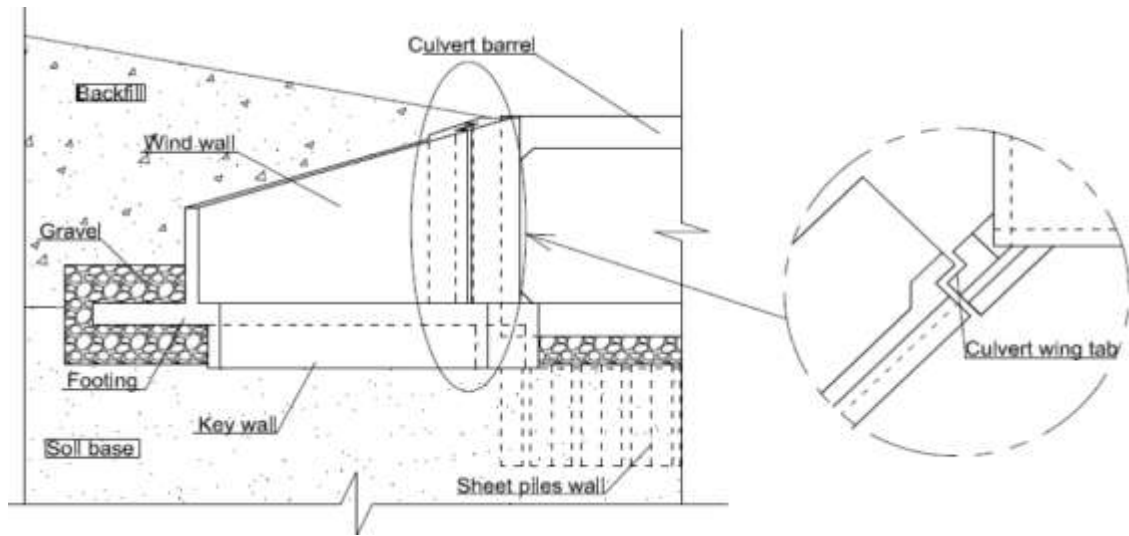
Front and plan view of the wing wall-to-culvert joint
